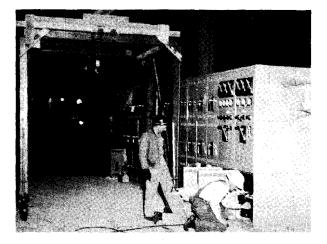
A job constructed rig used to move and set a 480-v switchboard in place on prepared channel bar.
